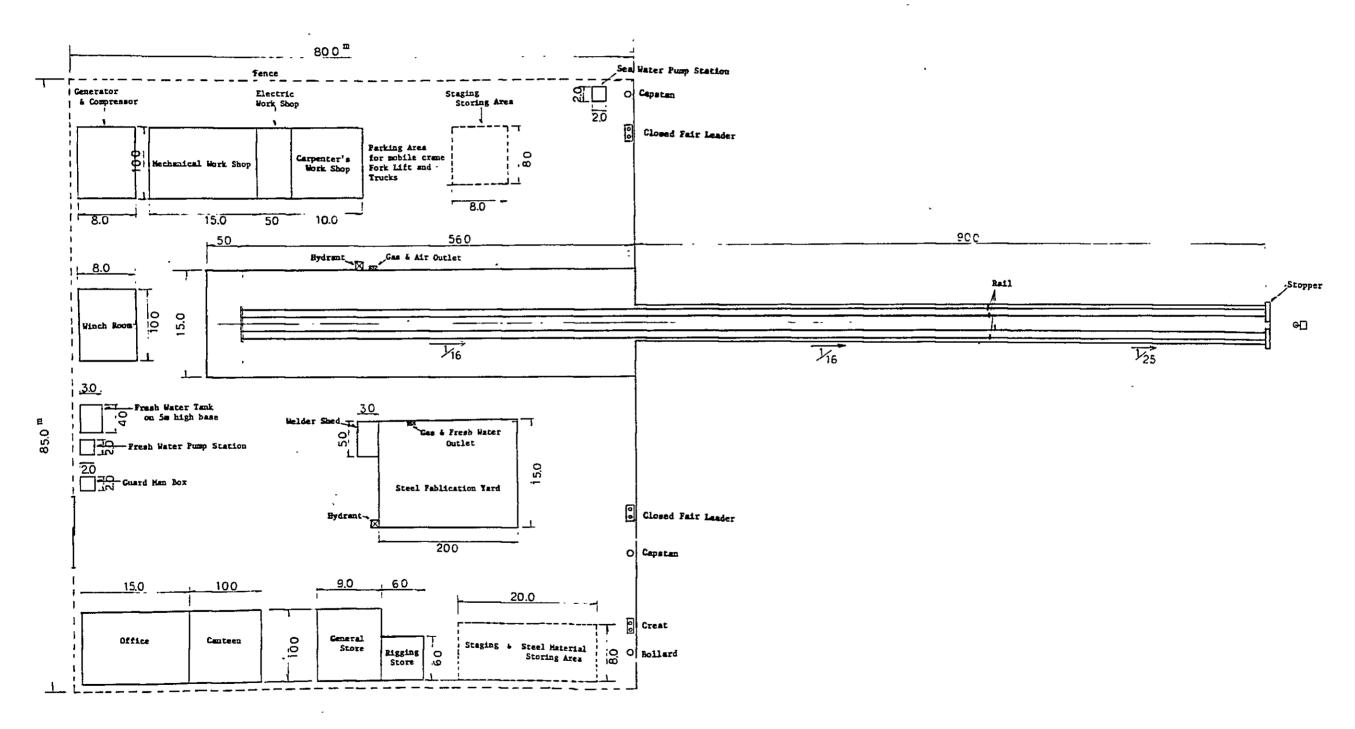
PLAN OF SLIPWAY AND REPAIRING FACILITY
